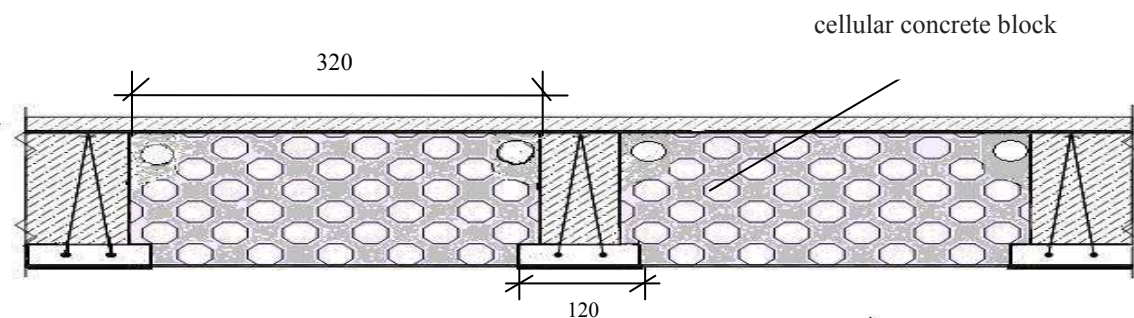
The schematic picture of prefabricated monolithic flooring with the usage of cellular concrete blocks
